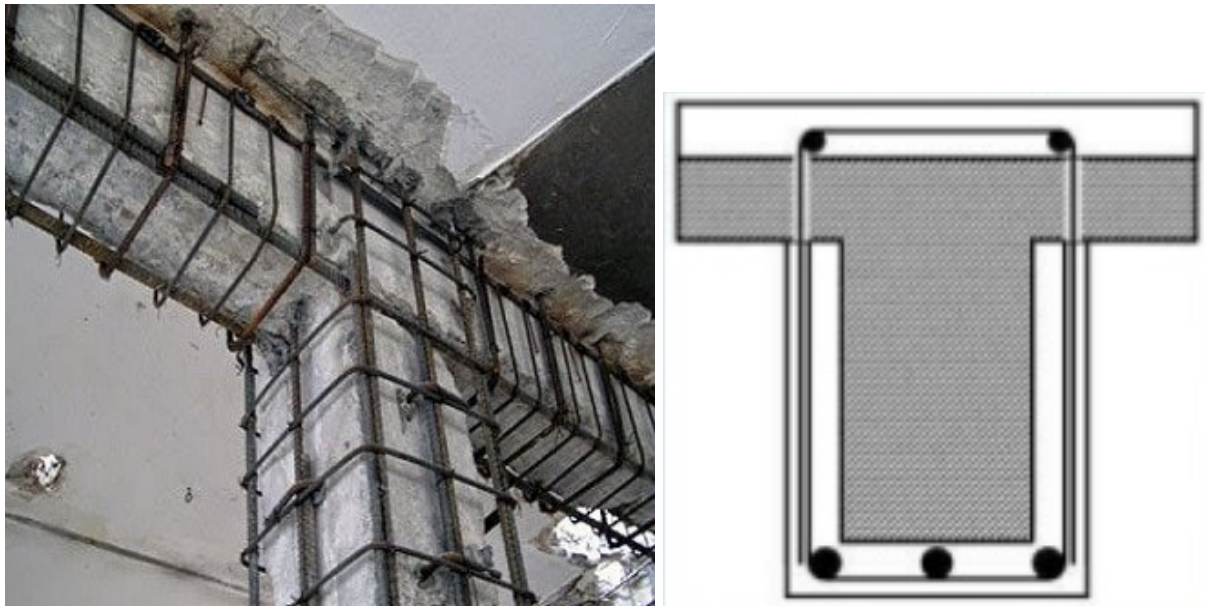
Jacketing of Beam using RCC jacketing (credit: yash construction)
